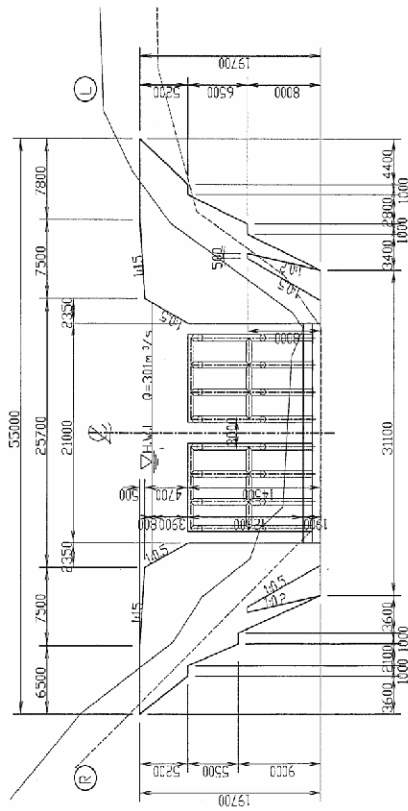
Illustration of Typical Sabo Dam Layout
